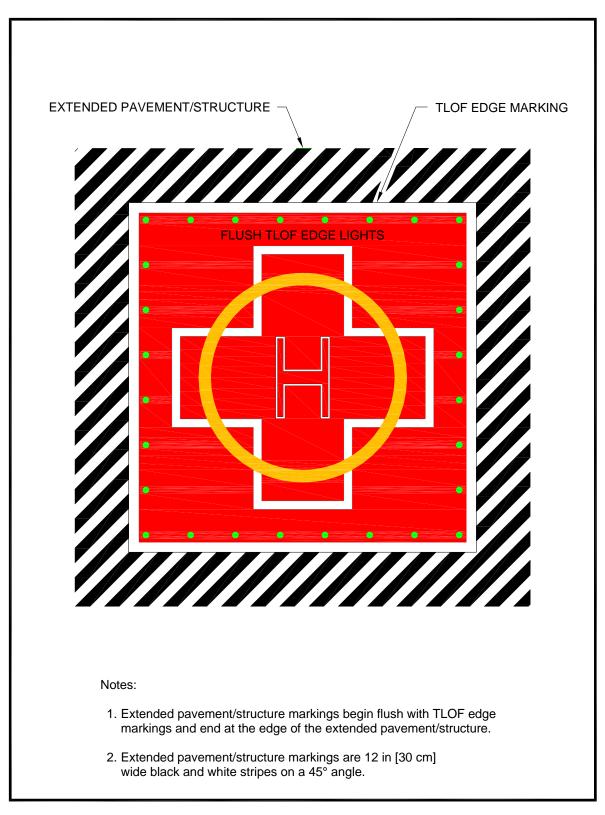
Extended Pavement or Structure Marking: Hospital
